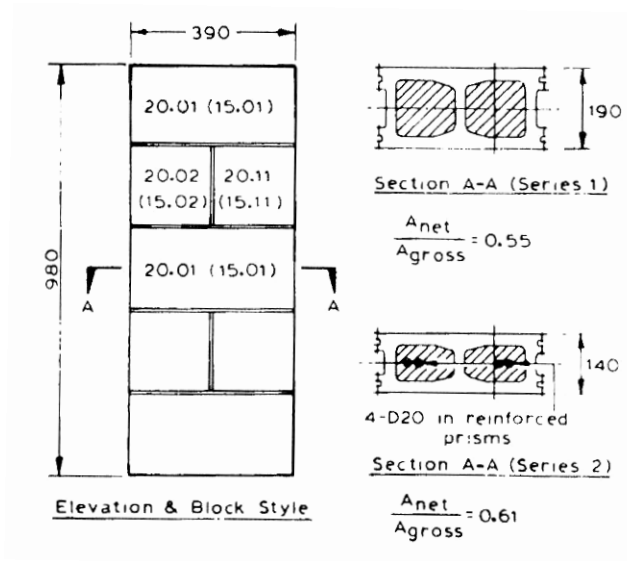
Typical layout and reinforcement details of masonry columns (Drysdale and Hamid, 2005)
